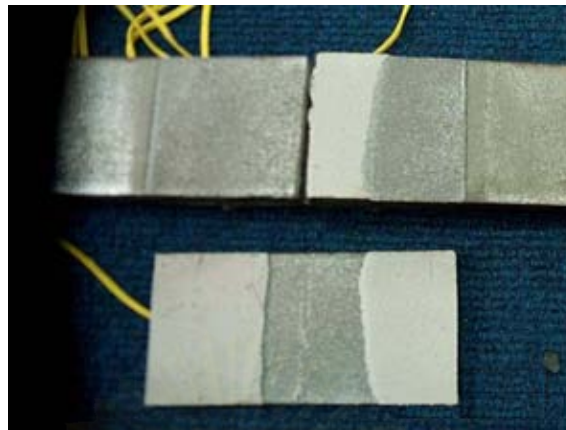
Typical failure of double-strap joint specimens (DSJ)
